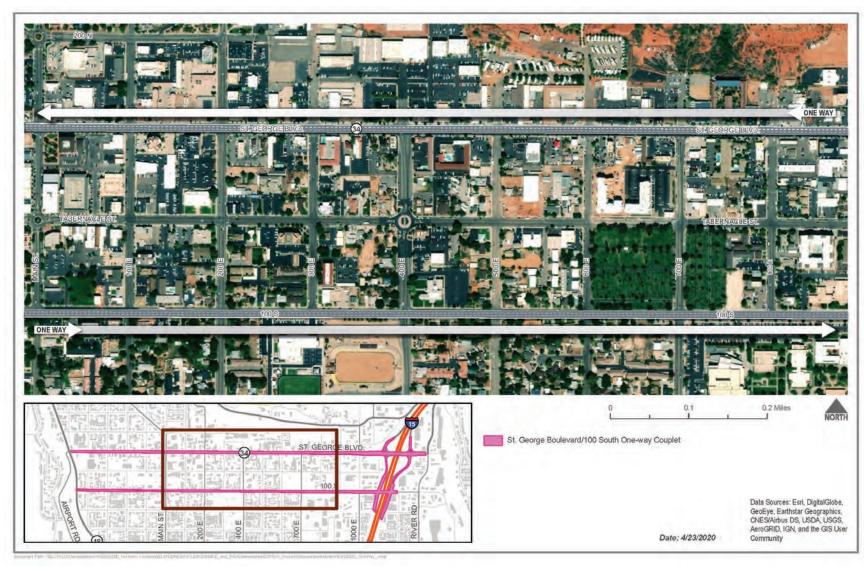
St. George Boulevard/100 South One-way Couplet Plan View (2 of 4)
